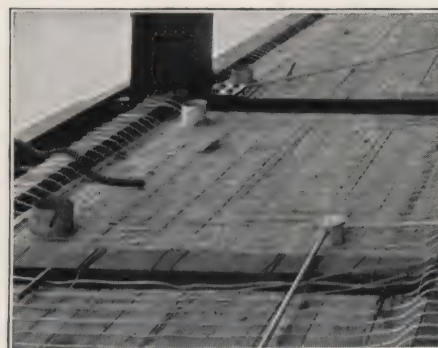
DETAIL VIEWS OF WIRE FABRIC REINFORCEMENT INSTALLATIONS IN THE WORLD'S LARGEST BUILDINGS
